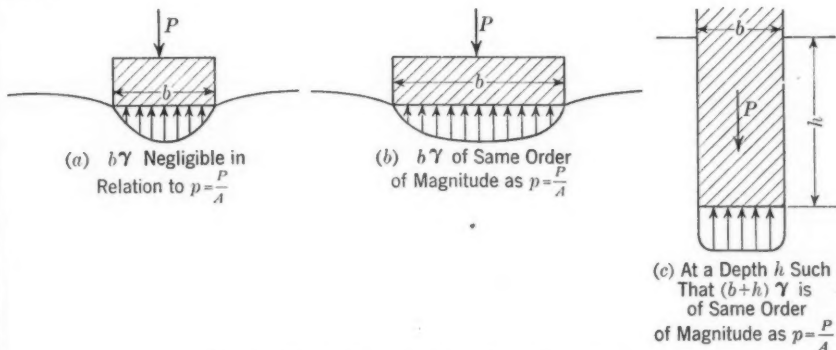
RIGID FOOTING ON THE SURFACE OF SAND
